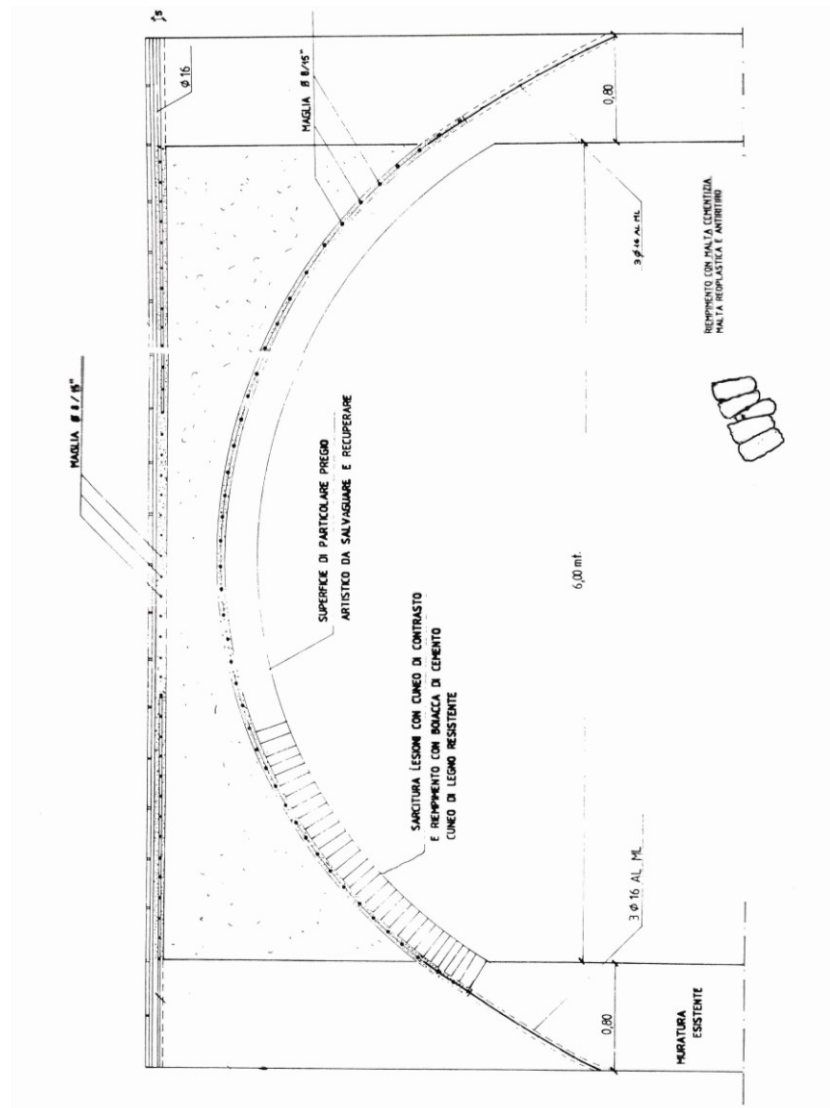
Technical design of consolidation of the vaults (by Ente Ville Vesuviane Archive)
